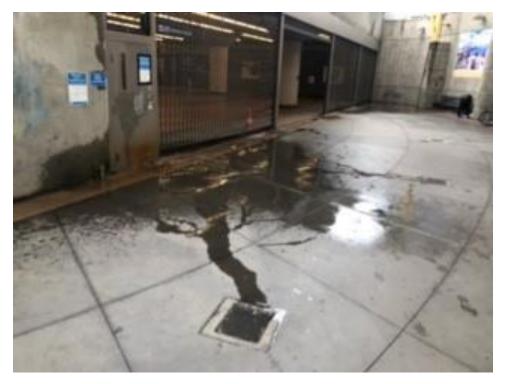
Leaks from roof of Visitor Center Building at BART entrance create safety hazard and create impression of blight
